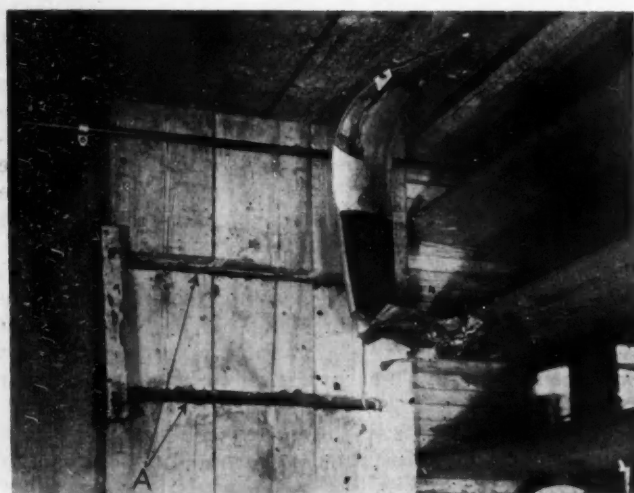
VIEW AFTER FAILURE OF PROPELLER WITH STEEL BLADE EMBEDDED IN ROOF
